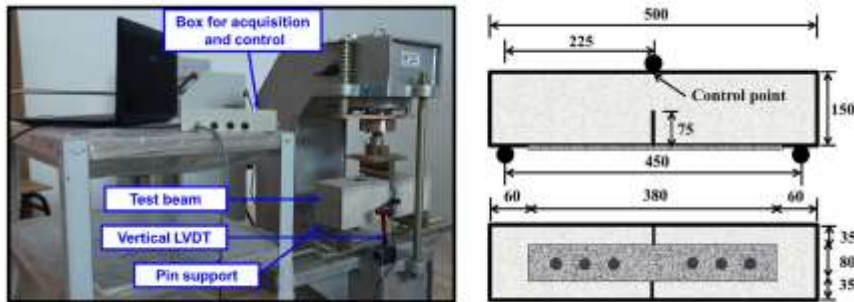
Loading device and specimen dimension according to ASTM D7958/D7958M regulation (all dimensions in mm)
